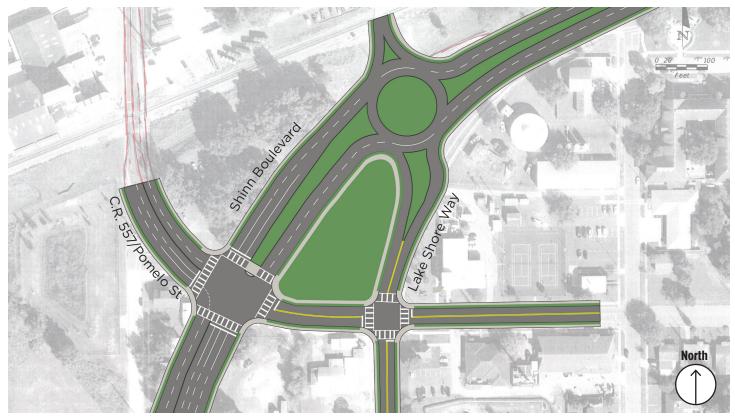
Two-Way Conversion Rendering of Lake Shore Way and Shinn Boulevard (from E. Echo Street to W. Cummings Street)
